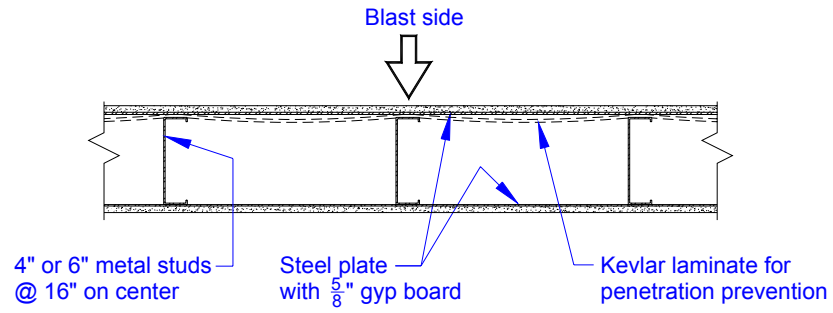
Secondary bearing wall to be blast-resistant, use Sure-Board™, for constructing stud walls.
